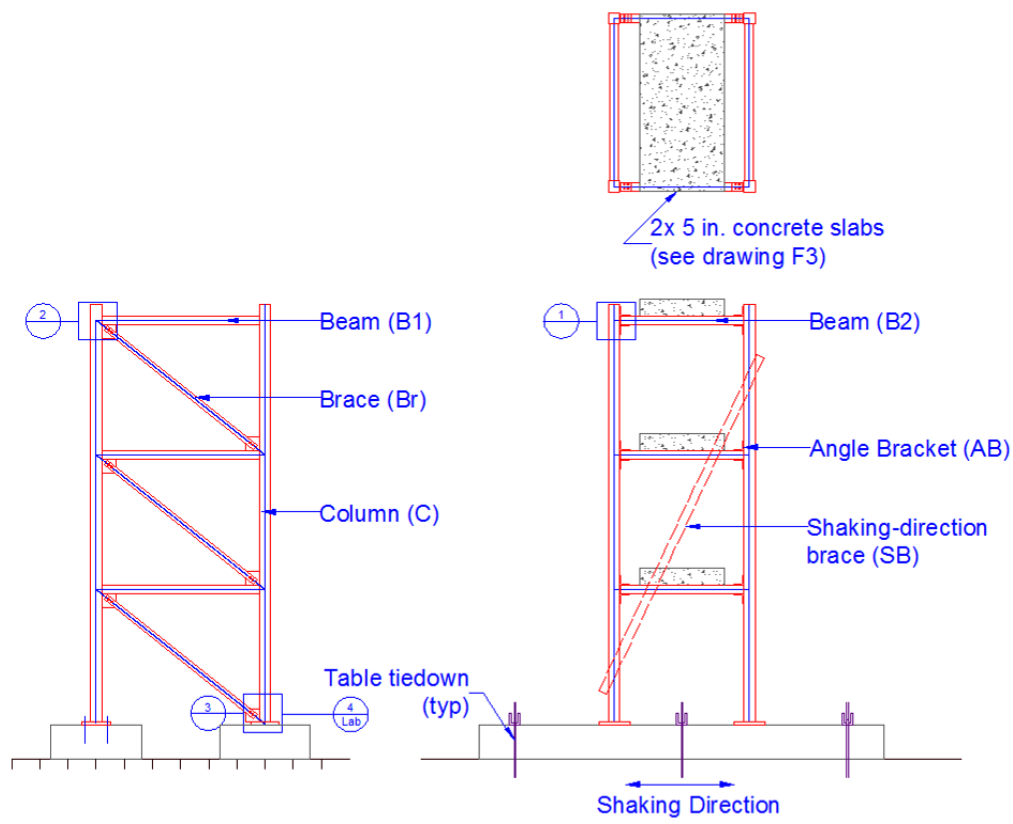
Overall structure configuration, plan view (upper right), N elevation (lower left), and E elevation (lower right)
